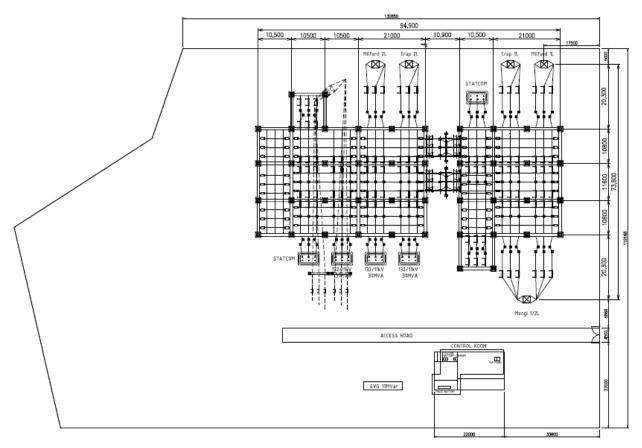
Layout of Taraka Substation after Connecting Mongi Power Station
